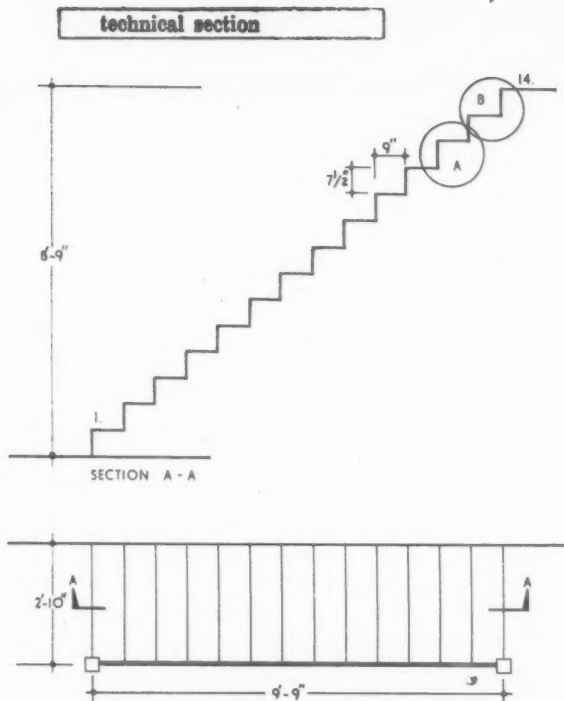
Straight flight stair and section. Details at A and B are on page 99.
